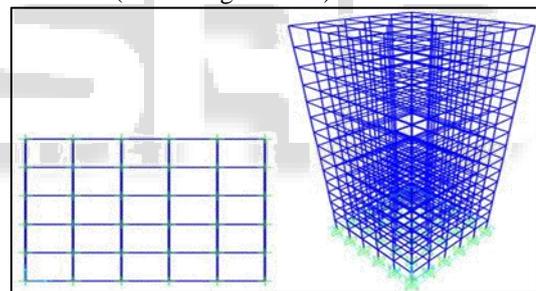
Modelled Buildings of 16 storey in SAP2000
